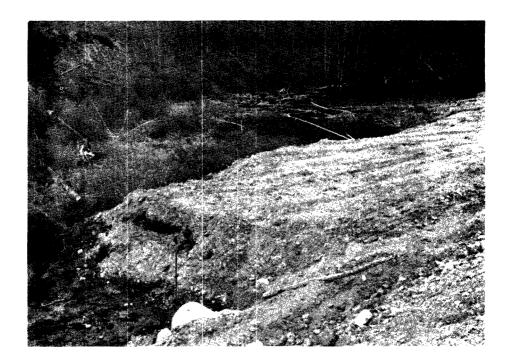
Excessive use of fill adjacent to wetland, poor drainage control, Alaska Highway, km 1393.
